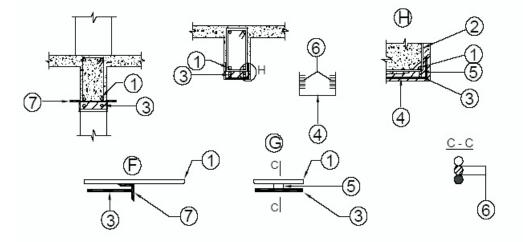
Strengthening of concrete beams by one-sided jacketing (1. Existing reinforcement; 2. Existing stirrups; 3. Added longitudinal reinforcement; 4. .Added stirrups; 5. Welded connecting bar; 6. Welding; 7. Collar of angle profile)
